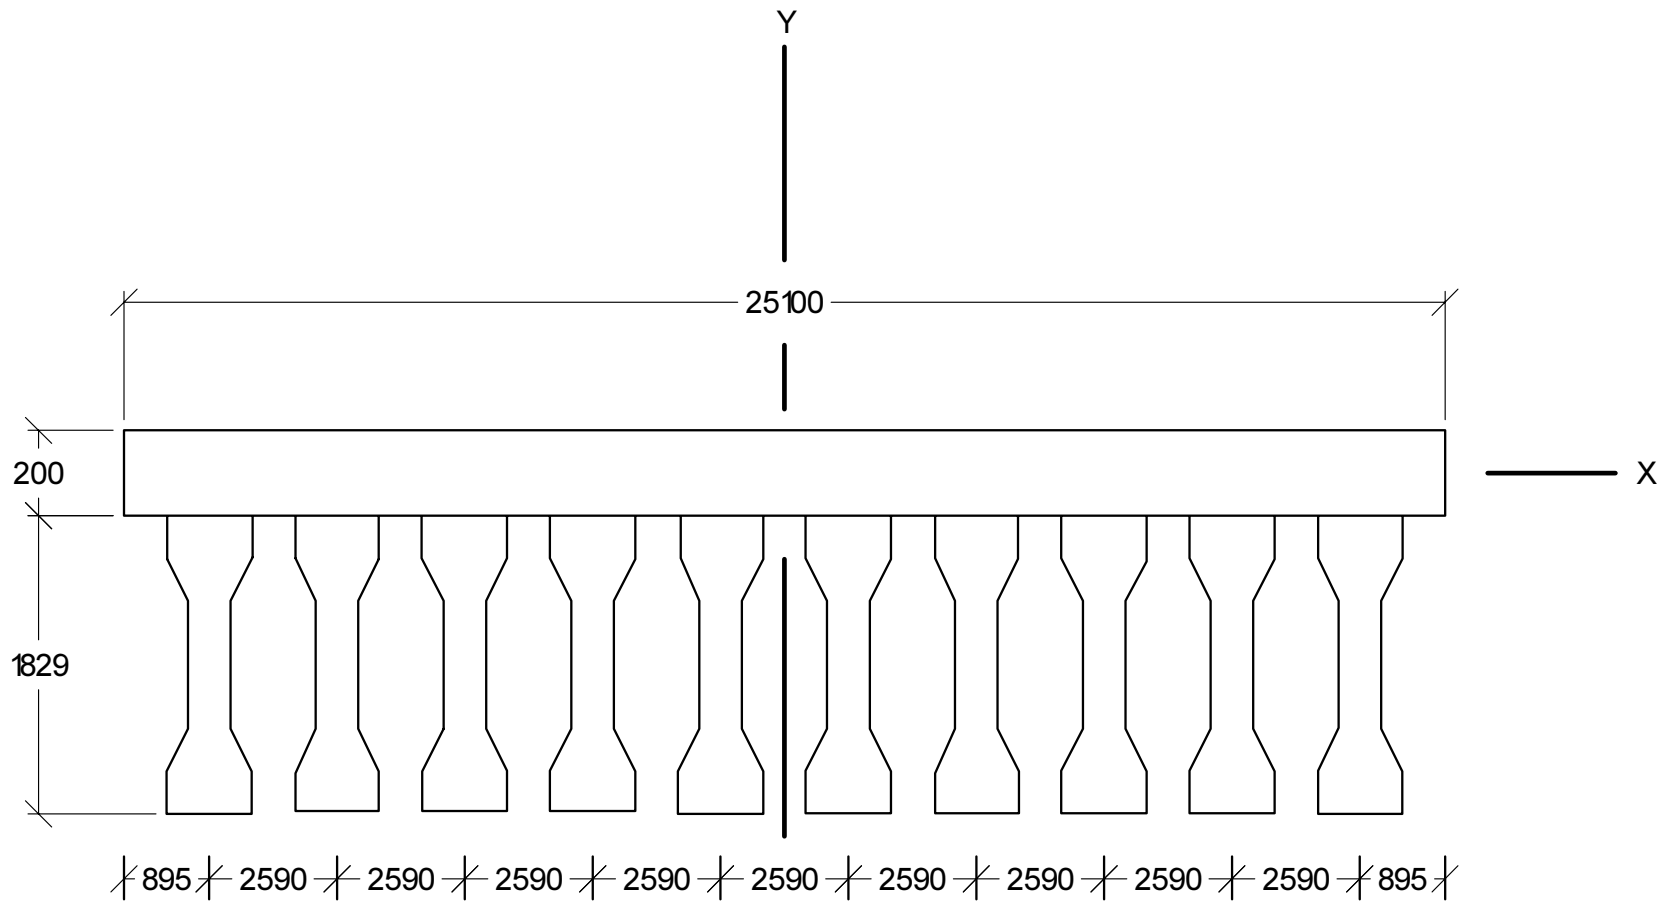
The simplified cross section of the prestressed concrete bridge superstructure. This figure was not drawn to scale. All dimensions are in mm.
